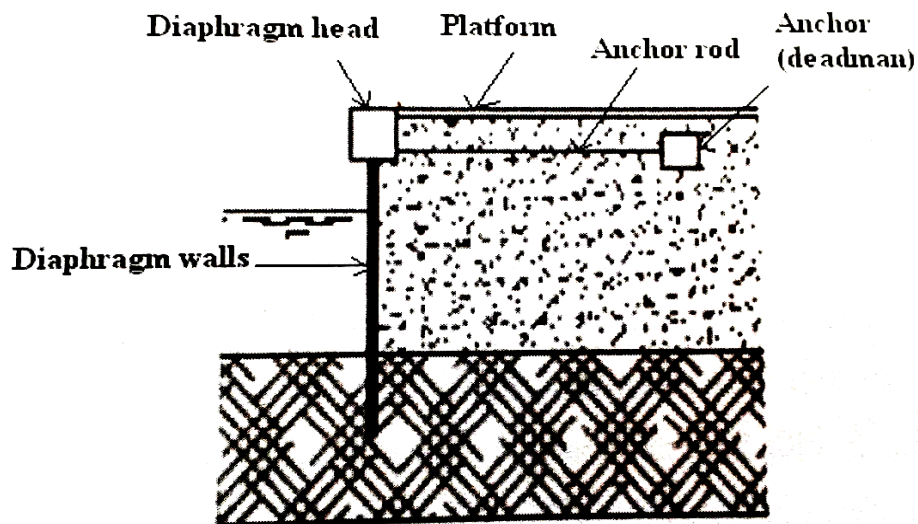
Anchored diaphragm wall (Gaythwaite, 1981)
